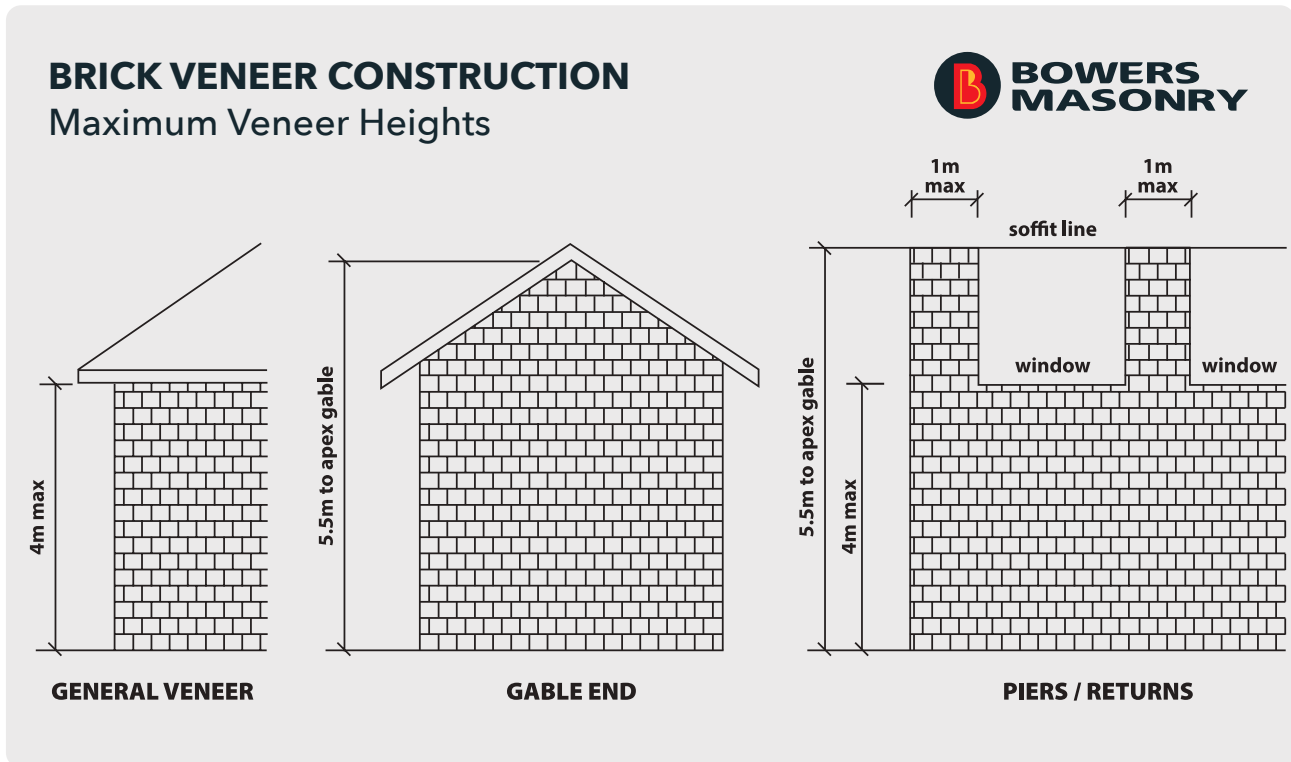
Maximum veneer heights for single storey, running-bonded construction - diagram sourced from Brick & Paver Manufacturers association
